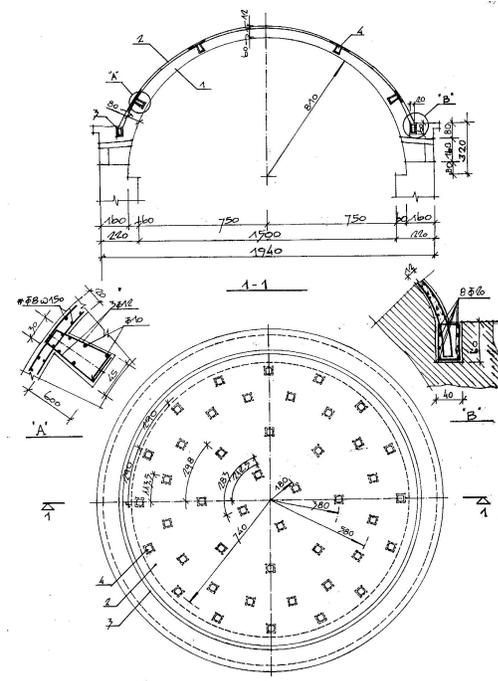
Dome strengthening construction. Vertical meridional section on 1-1. Plan. 1 - stone dome; 2 – reinforced concrete shell; 3 – supporting ring; 4 – connection elements.
